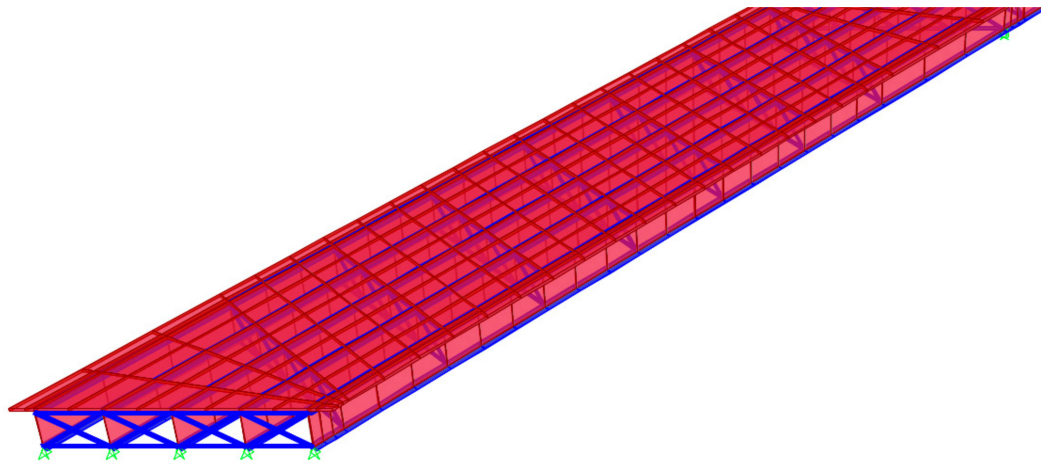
Typical finite element (FE) model of a skewed composite I-girder bridge.
